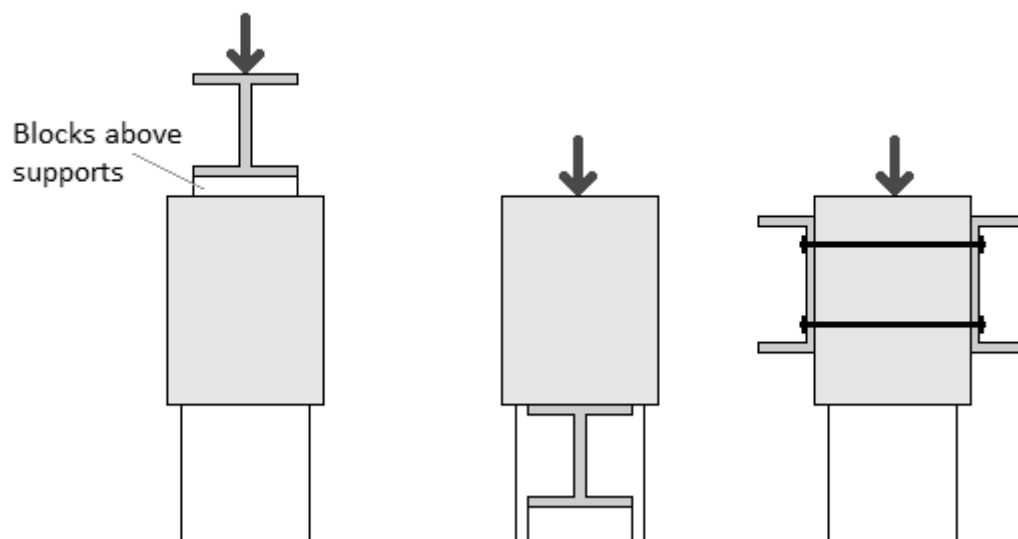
Different ways to strengthen beams with steel profiles a) above, b) beneath and c) on the sides of the original beam, after Statens råd för byggnadsforskning (1978).
